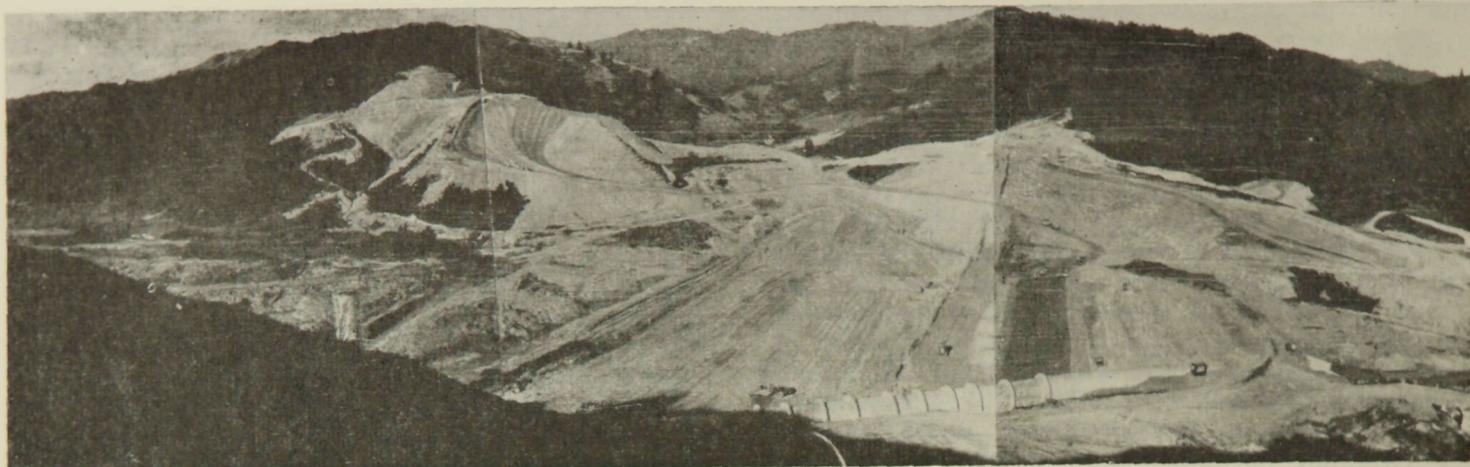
Panorama of Upper Mangatawhiri dam, from west abutment, March 1963.
